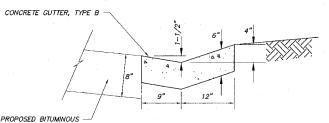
DETAIL-PRIVATE AND COMMERCIAL DRIVEWAY ENTRANCE
